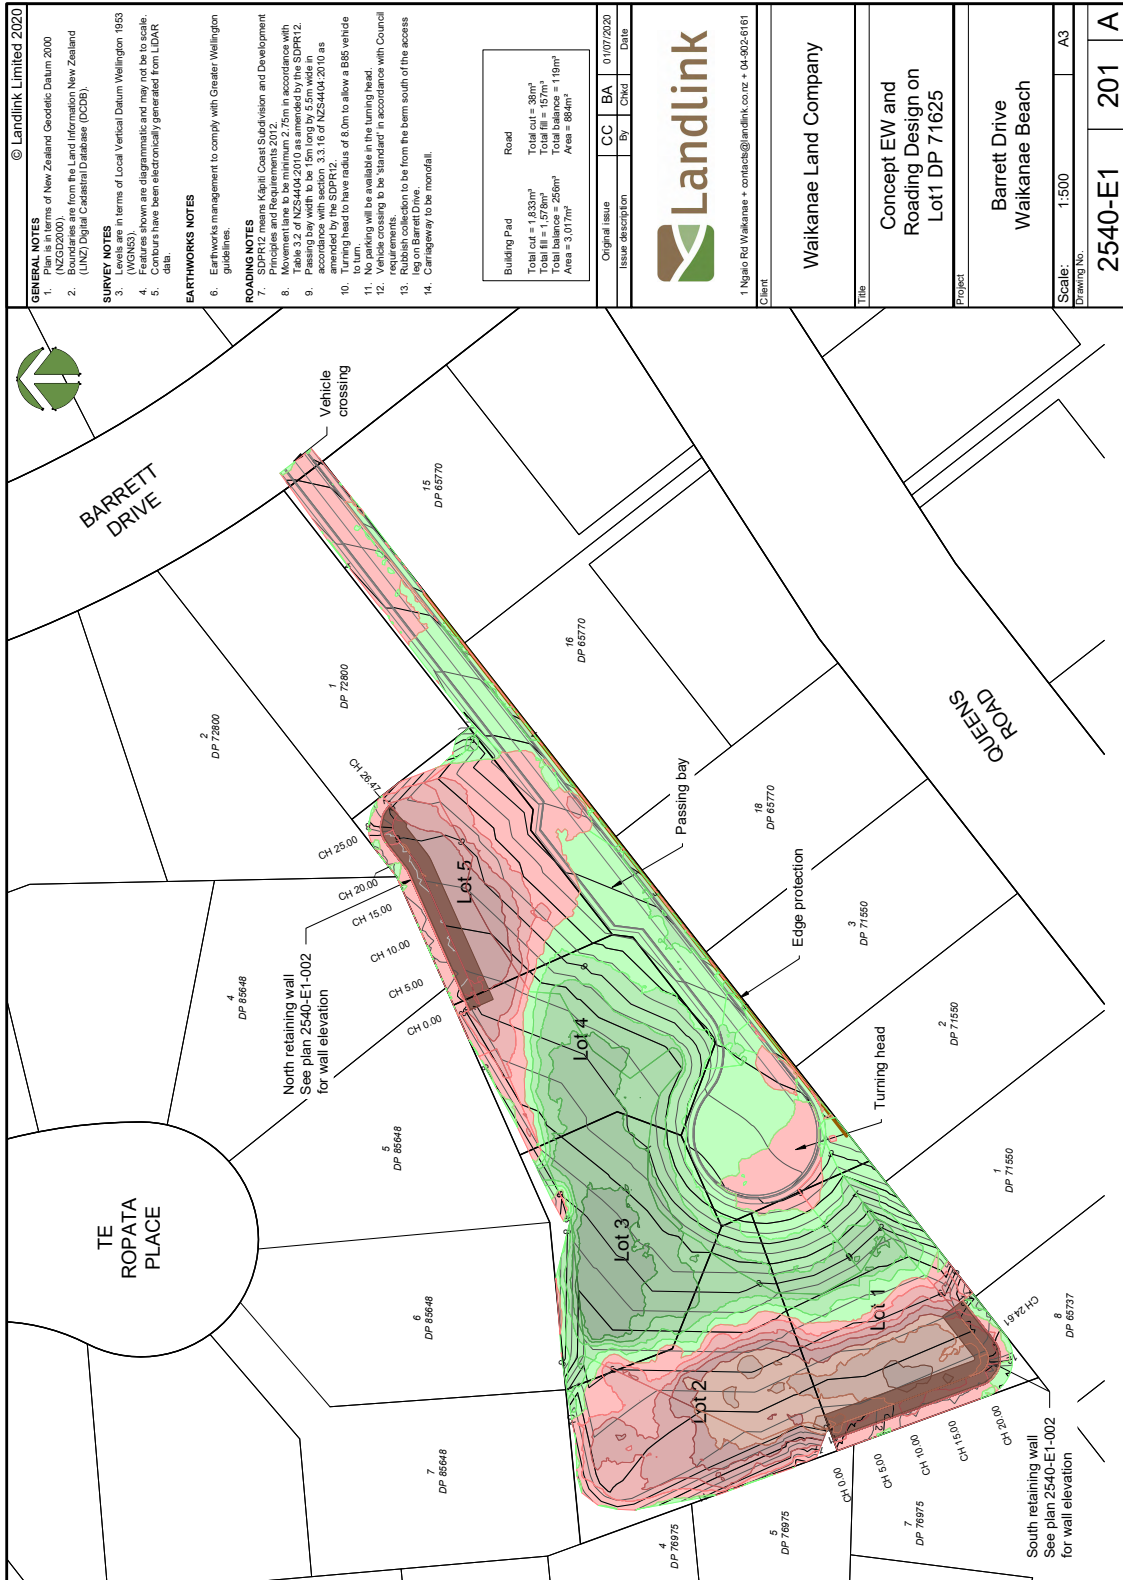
Stage 4B – cut/fill and roading plan (Source: Landlink 2020).
